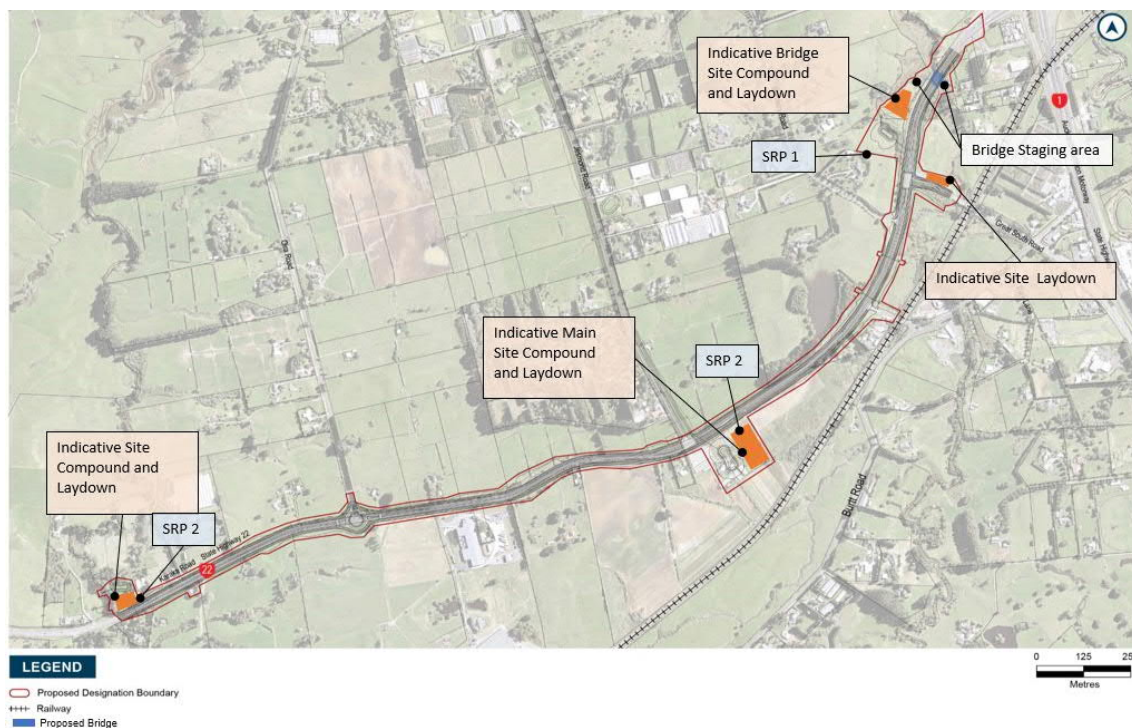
NoR D1 Indicative Construction Areas, Compounds, Laydowns and SRPs
